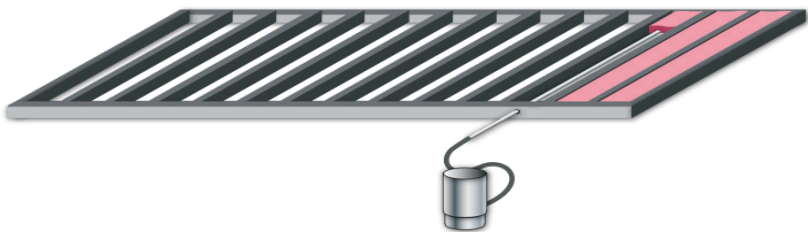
Insulating floor cavity from the side where the floor joists run crosswise to the mobile home
